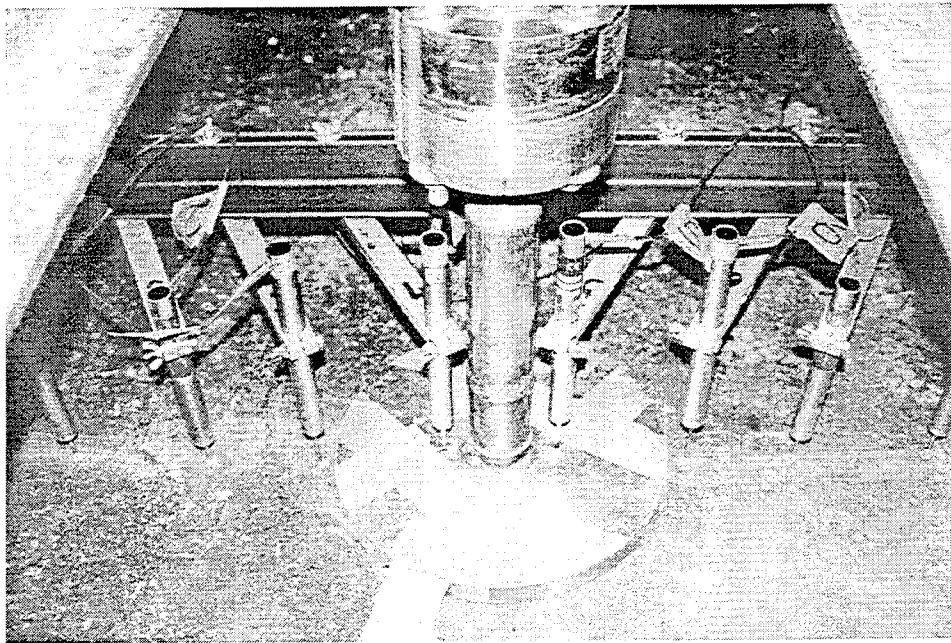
Image of the pavement load plate and surface instrumentation.
